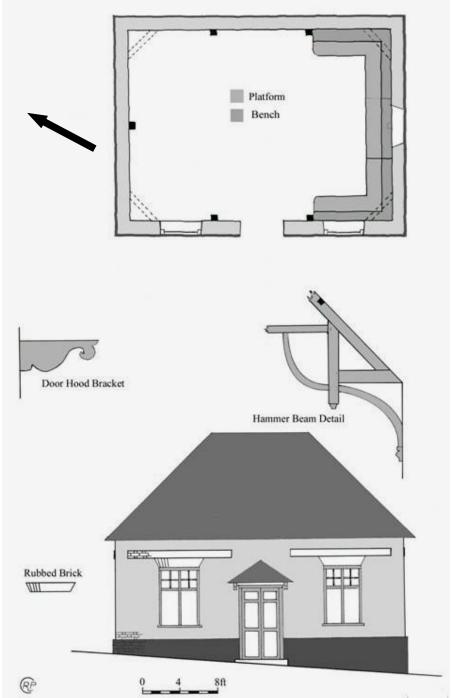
Plan and front elevation of the Meeting House (By Roy and Vera Perry)
